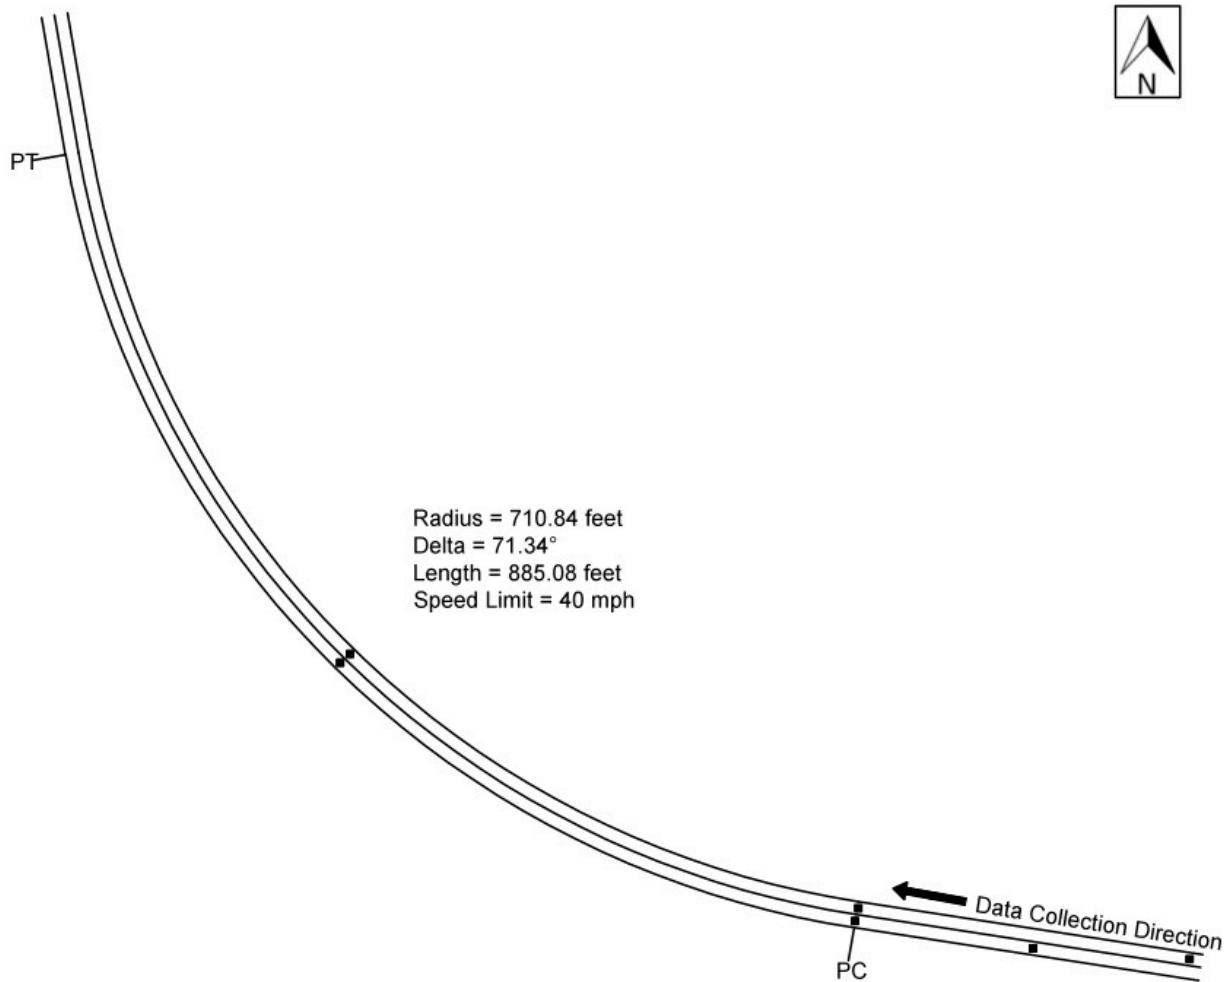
Diagram. Geometric layout of Alabama Location #6 (not to scale).
